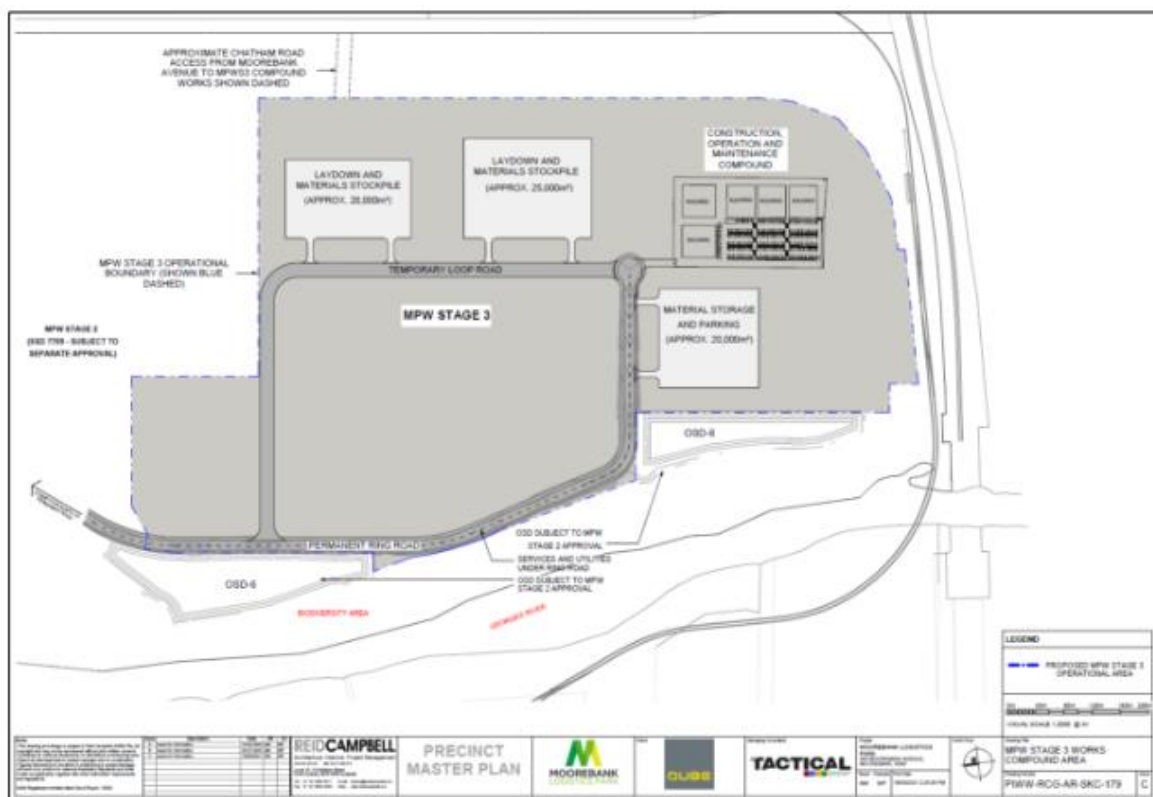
Moorebank Precinct West Stage 3 Layout (Watson YoungArchitects)
